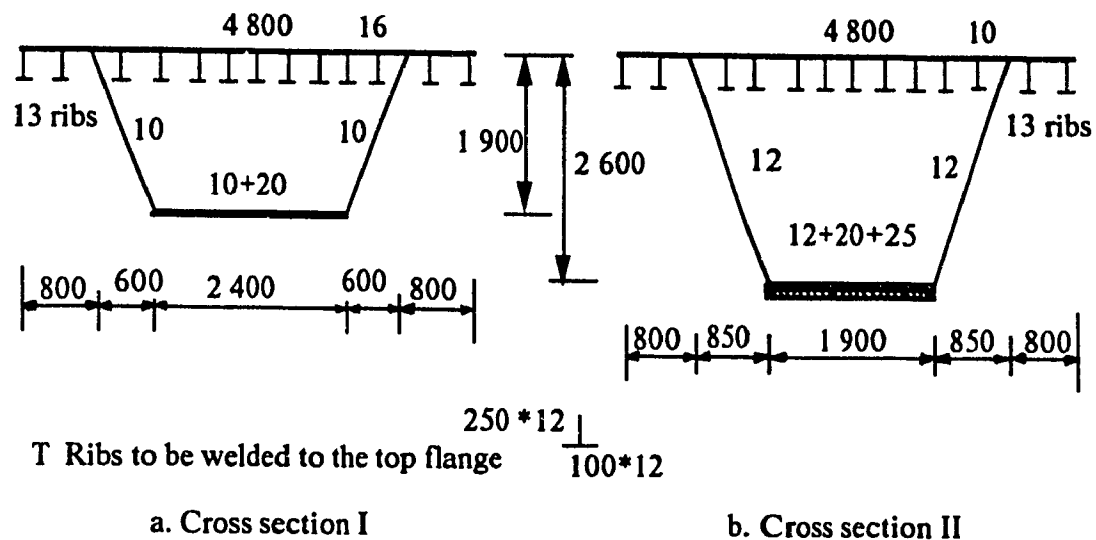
The cross sectional geometry of the prototype, all dimensions in mm
